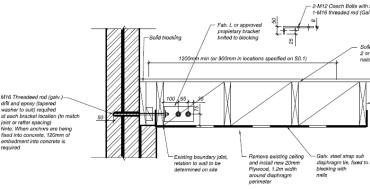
Diaphragm to Wall typical remedial detail - Joist Parallel
